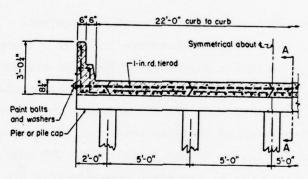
Typical sections of pretensioned slab bridges and some type of leveling course is normally required.
